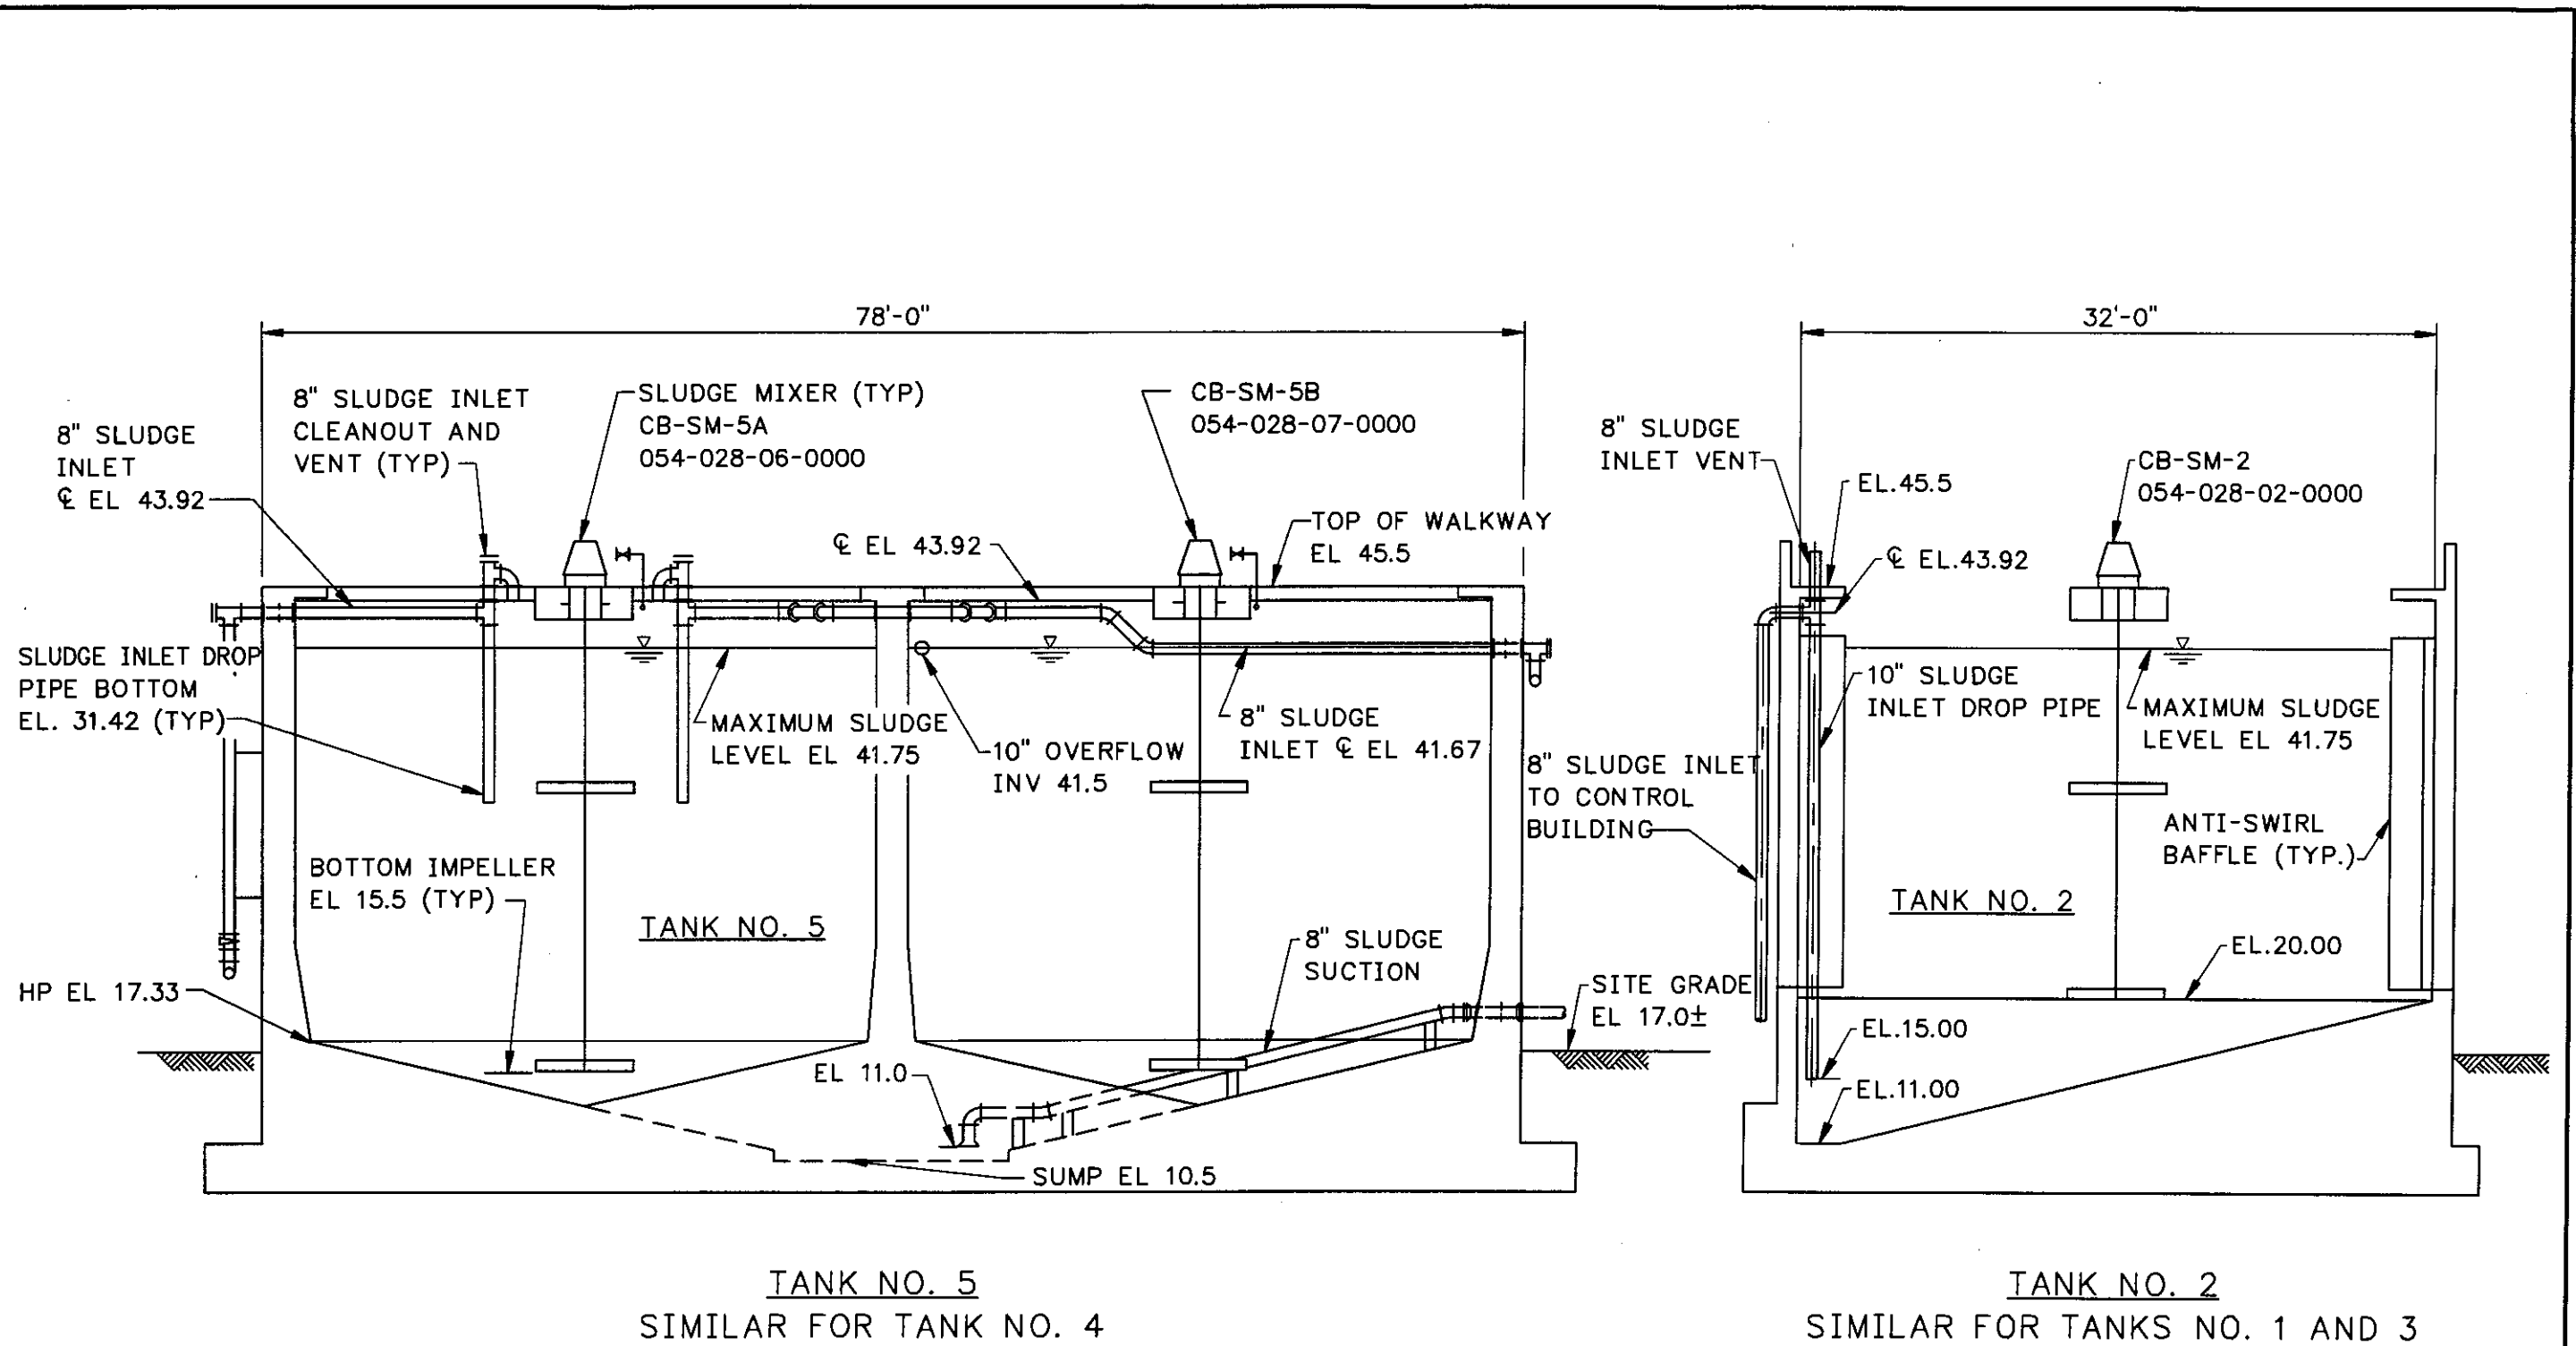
FIGURE III-SD-SCB-2 SLUDGE STORAGE TANK CROSS SECTION
